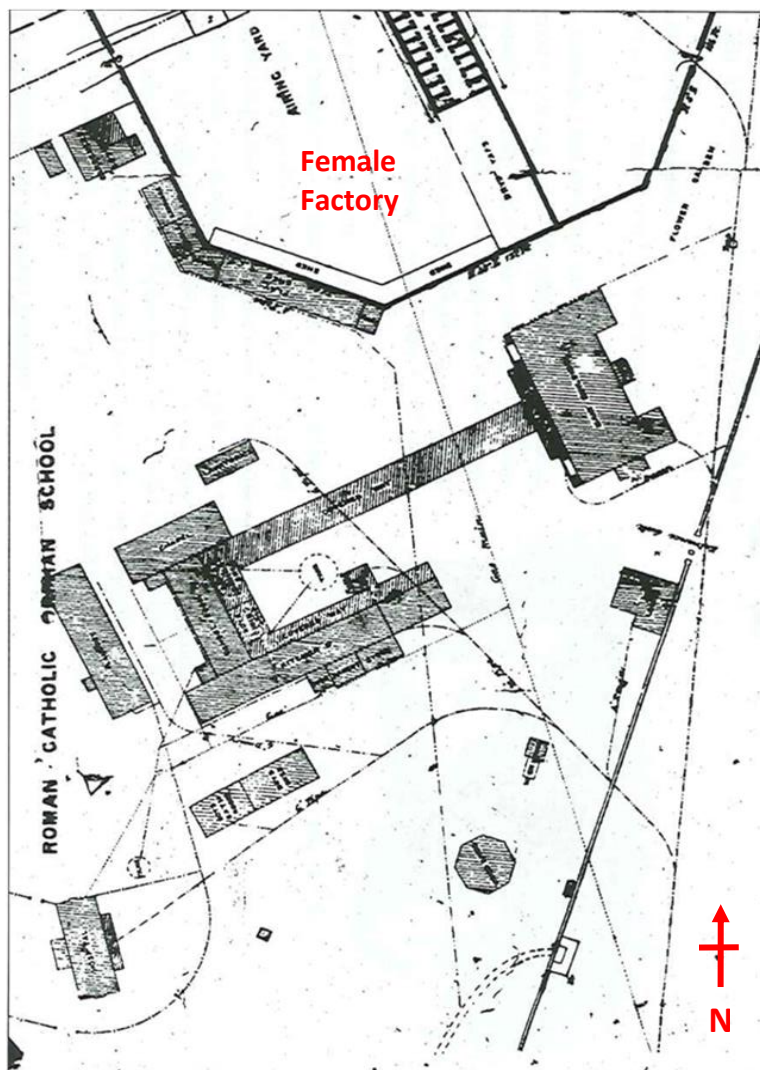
Detail from site plan of RCOS, July 1880 on Plan for Hospital for the Insane Parramatta. Signed J Barnet (copy held DPWS). From Kamballa Archaeological Assessment, 2000:12.
